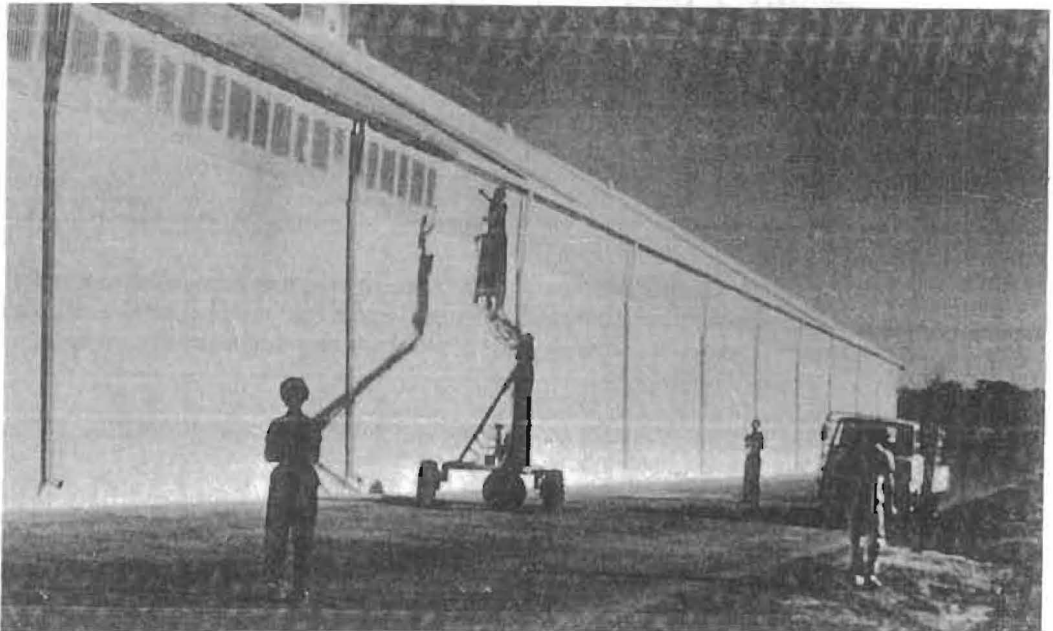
Application of final coat of reflectant material over previously sealed roof and wall at Meckering.
